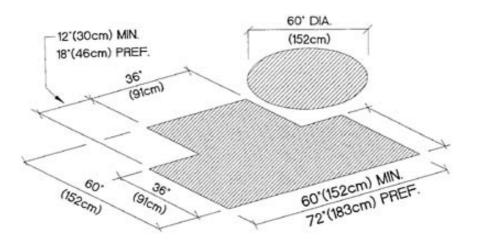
Clear floor space for turning wheelchairs (Source: Peterson, 1998).
